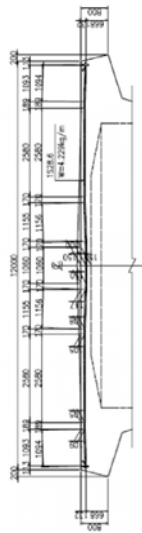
Cross-section of the Top Slab of the PC-Girder
